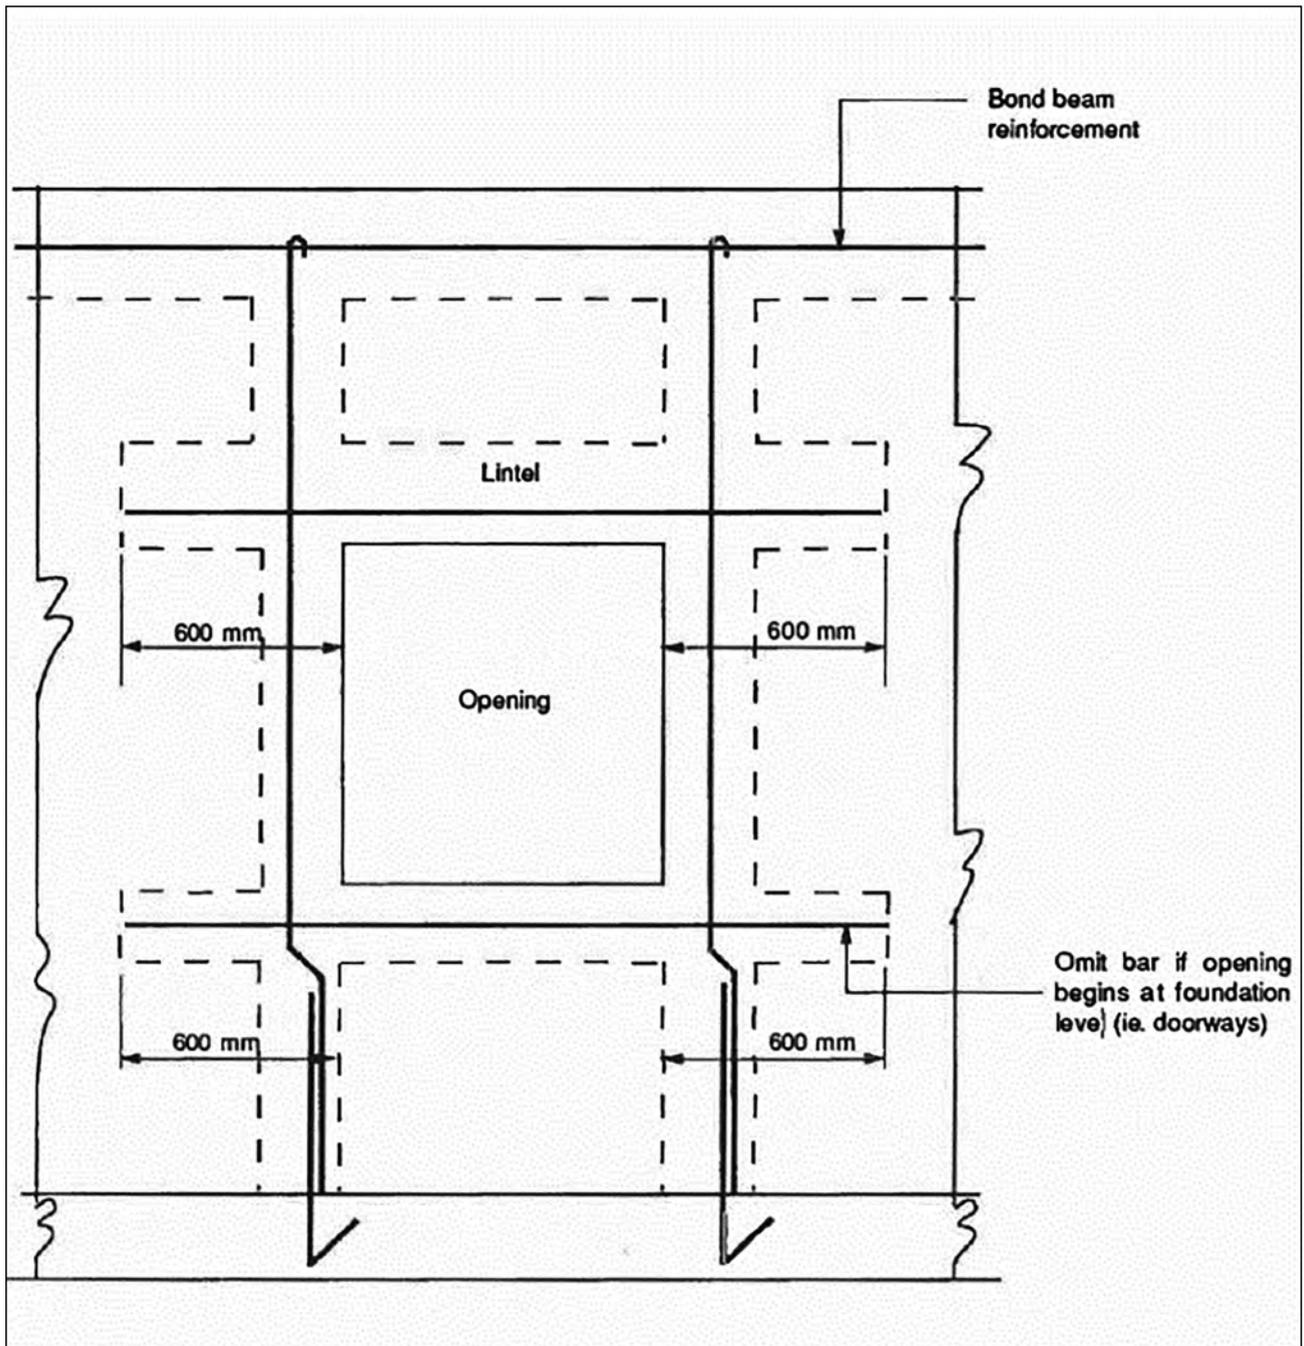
B: REINFORCEMENT DETAILS AROUND OPENINGS IN WALLS
